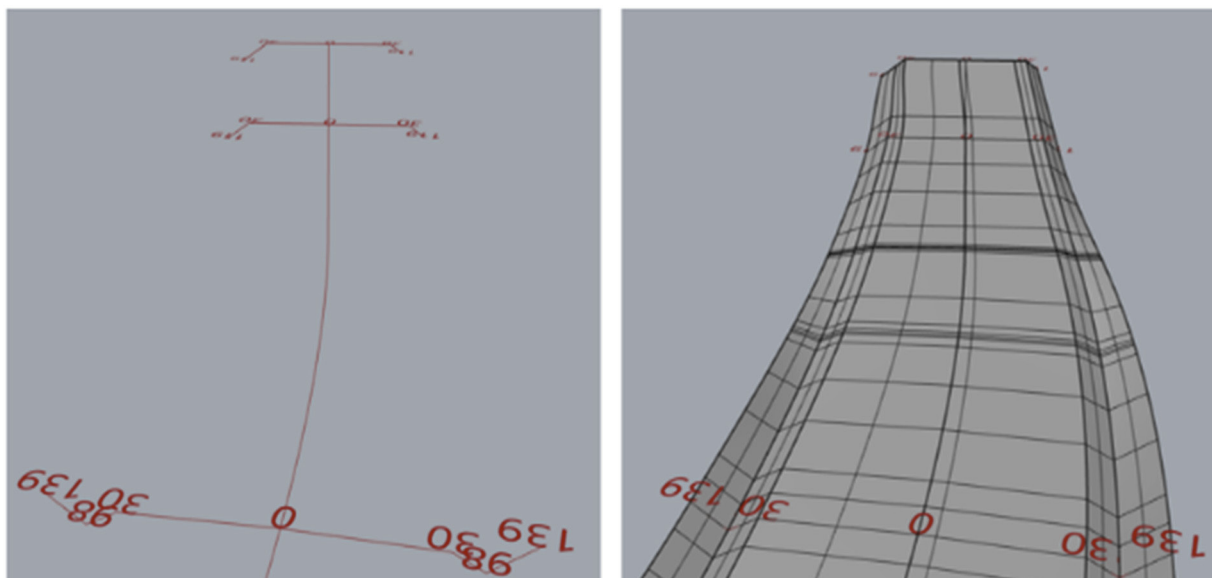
Demonstration of sectioned shape to nominate geometric road surface.
